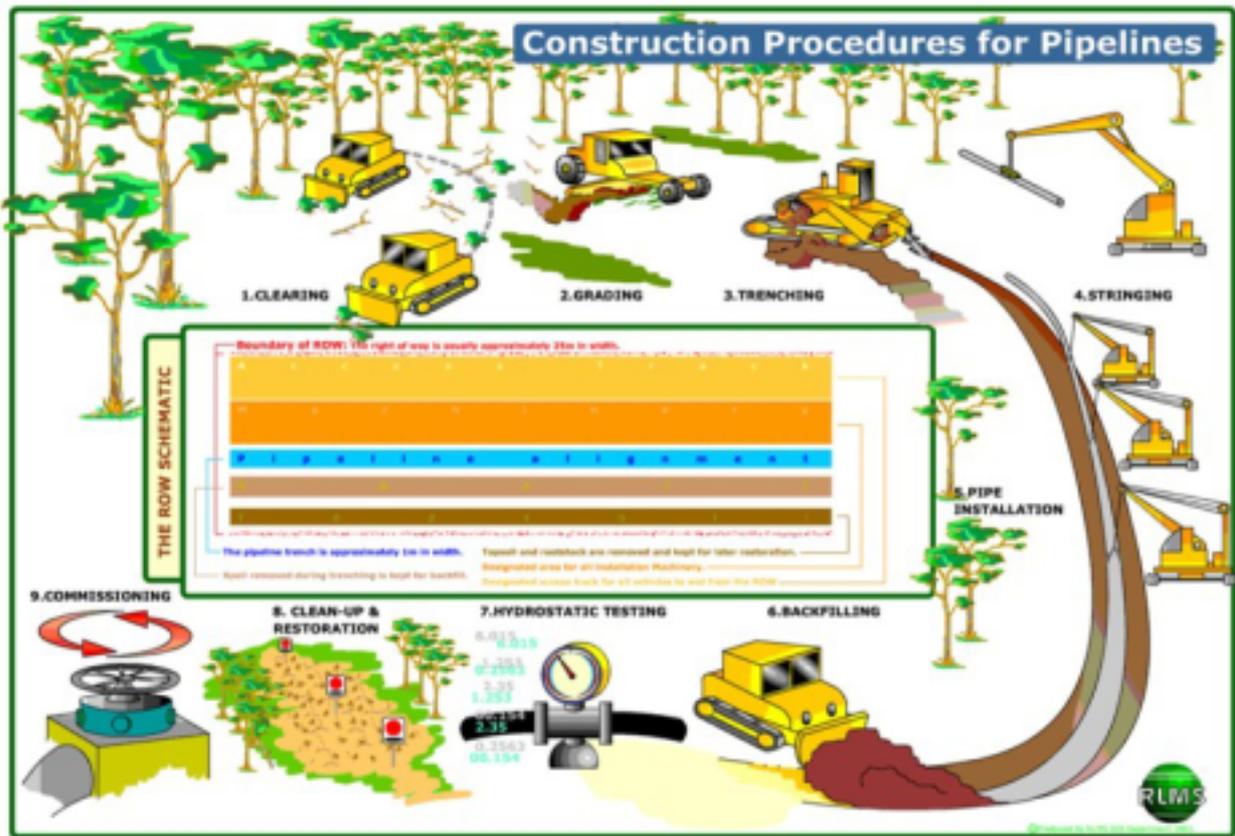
Typical pipeline construction activities (Source: RLMS)
